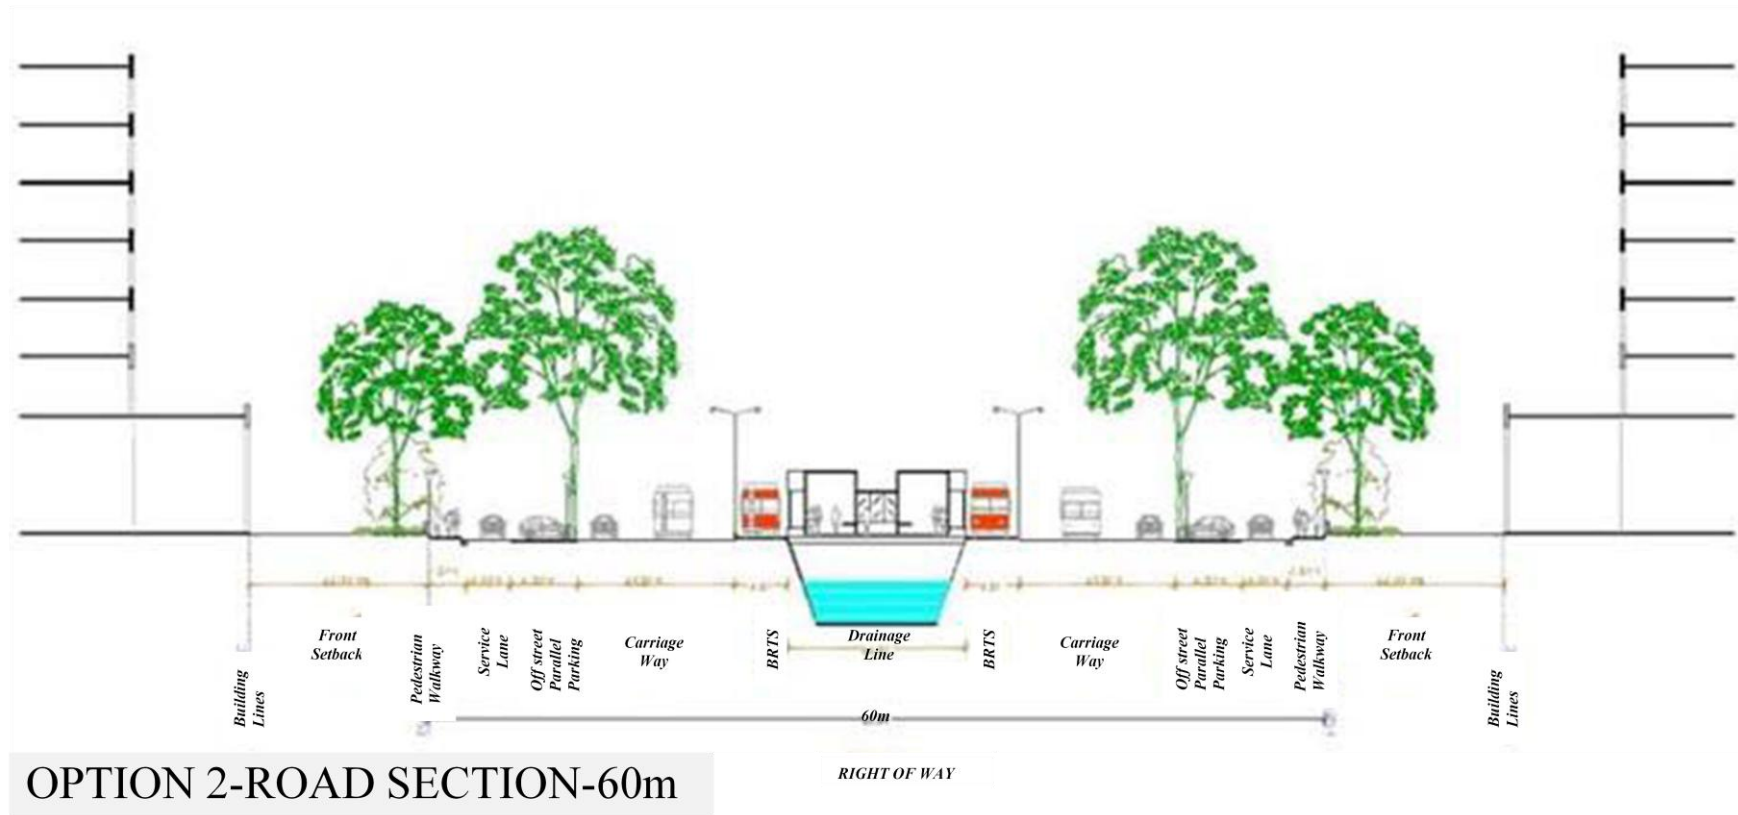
Pocket Outer-Road (60 m wide) Road Section - Option 2
